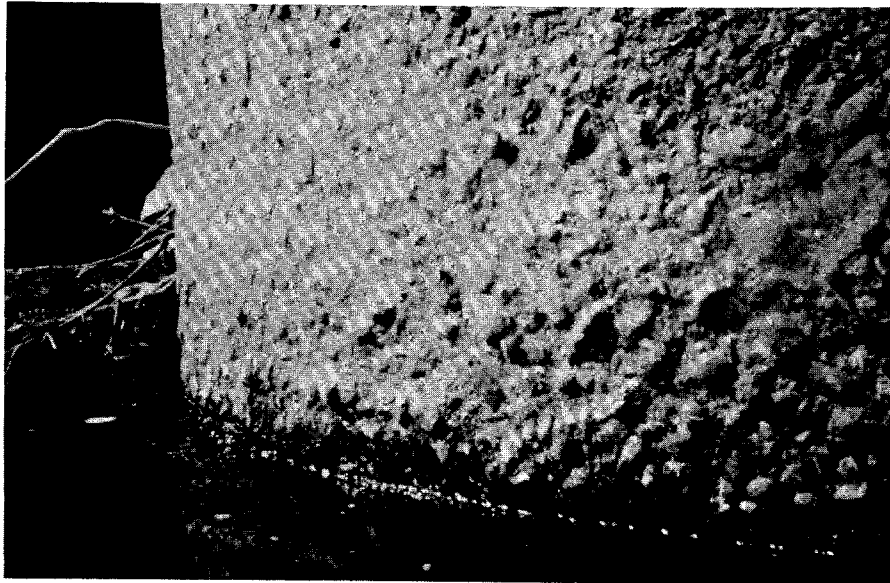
View of downstream face of cylindrical pier showing abrasion damage as photographed about 1971, 13 years after bridge construction. (From Oregon Dept. of Highways.)
